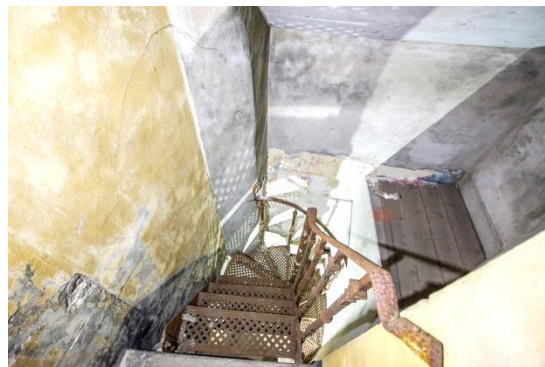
Room 24: Projection room stairs from landing looking down and west.
